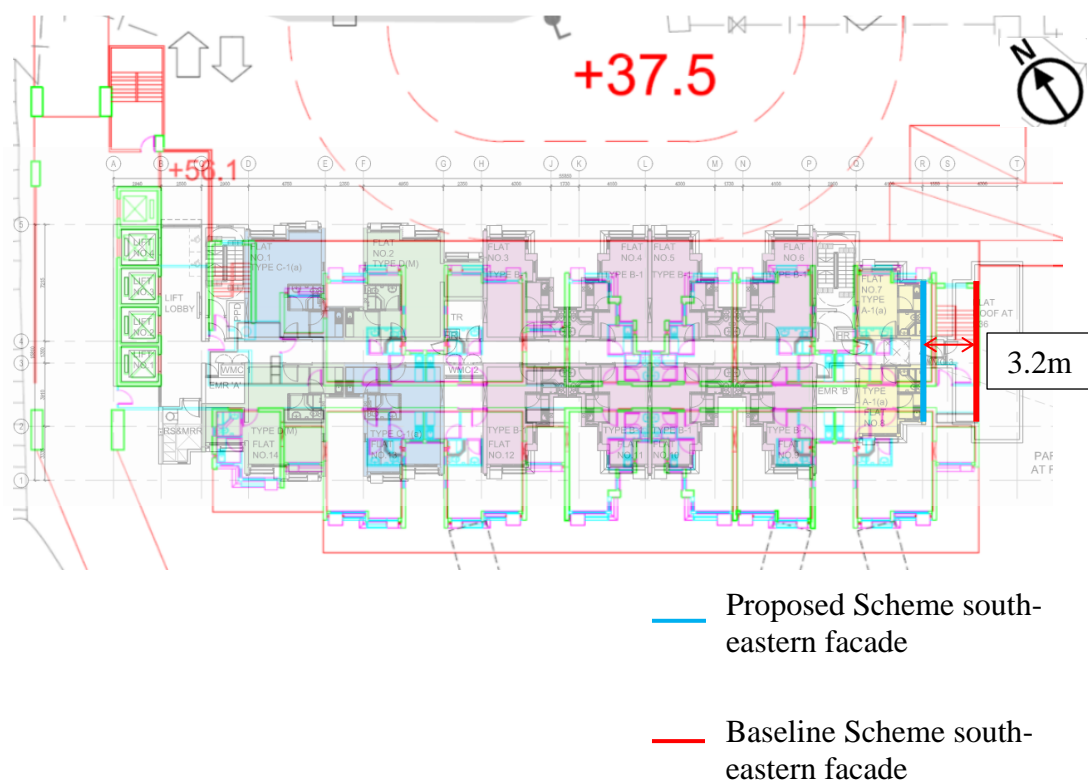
Additional tower setback from south-eastern boundary above 35/F
